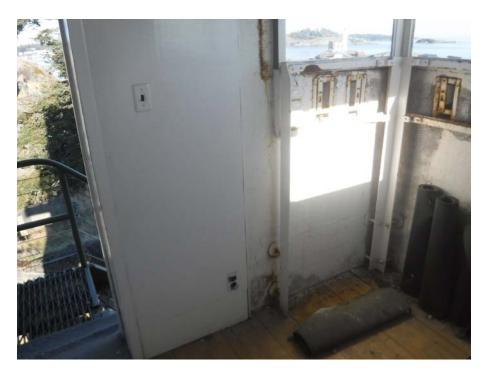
Interior surface of wall pier covered in wood panels and exposed concrete below window
